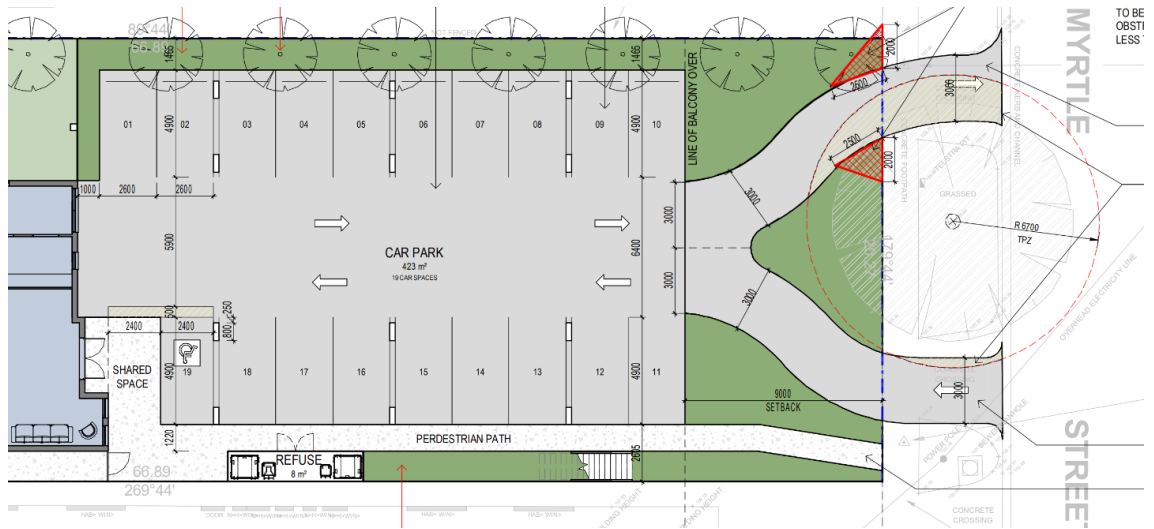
Extract from plan TP A101 rev P5 dated 1 September 2024 prepared by The Ellis Group Architects
